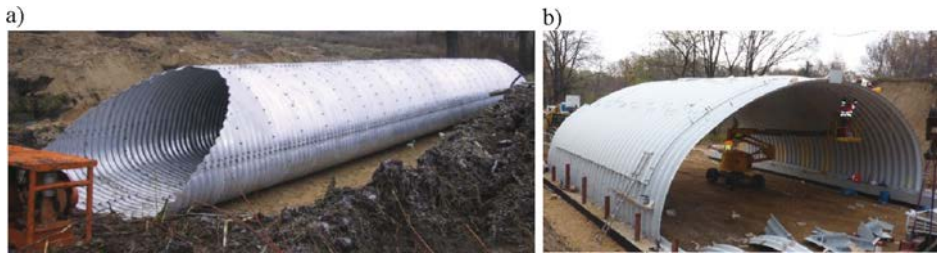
Assembly of CSP shells: a) closed profile on the ground, b) open profile on the RC strip footings
